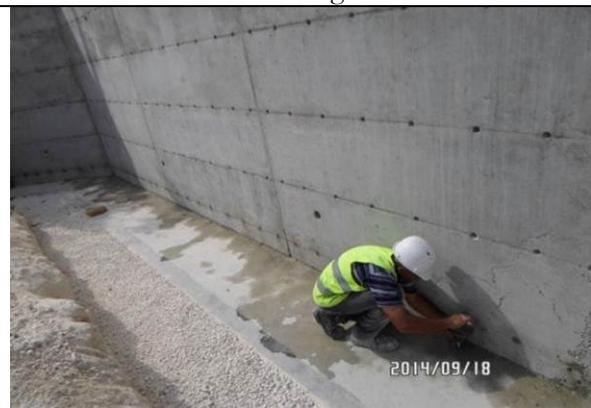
h of September, 2014: Starting concrete repair of the internal side of the retaining wall.
